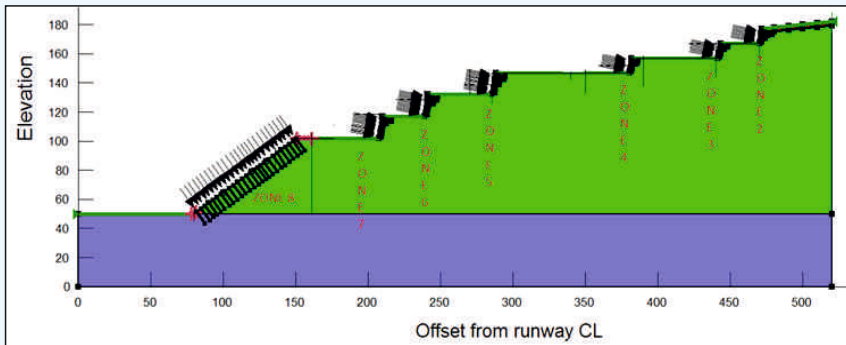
Soil Nail Reinforcement at Different Zone of the Slope
